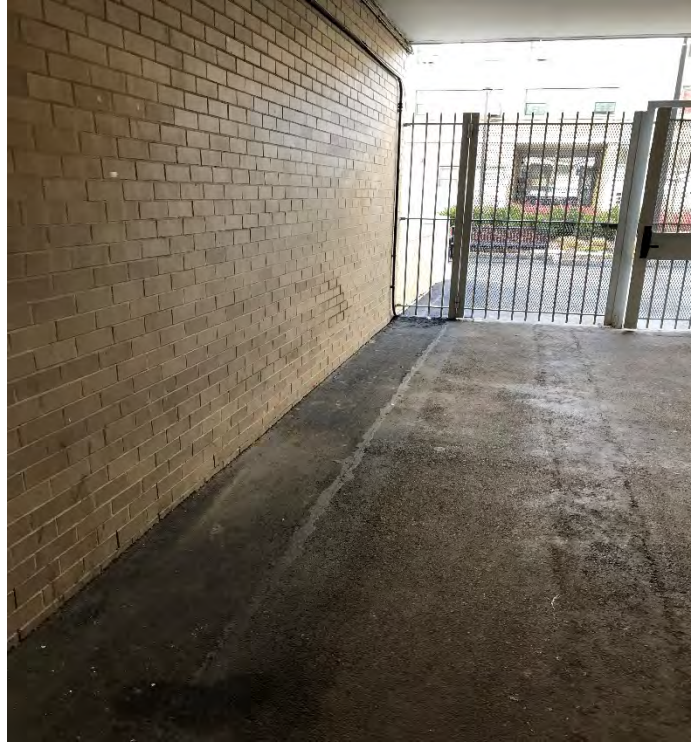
Photo showing cover system in the breezeway, looking southeast.
